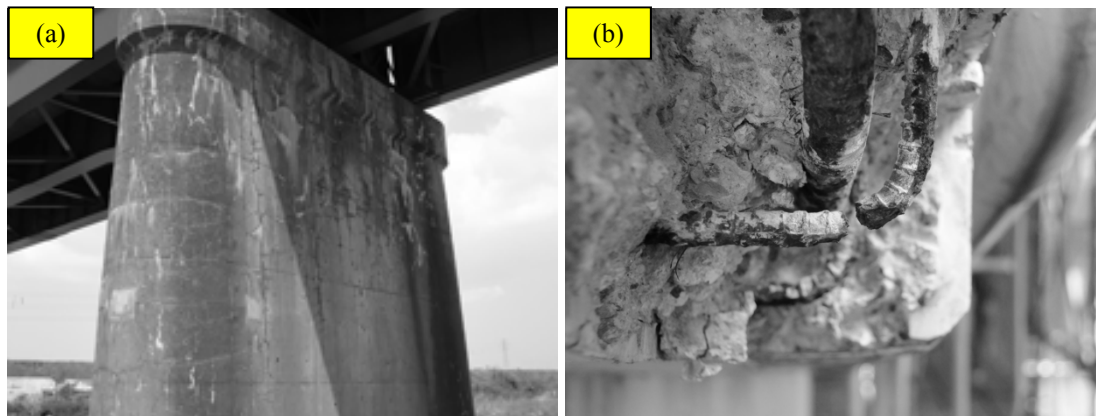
(a) Example of a pier deteriorated by ASR. Many cracks with ASR gels and free lime were found on the upper side of the pier. (b) Example of the rebar ruptures by the expansion of ASR. Some of stirrups were ruptured at the corner of the beams and footings.
